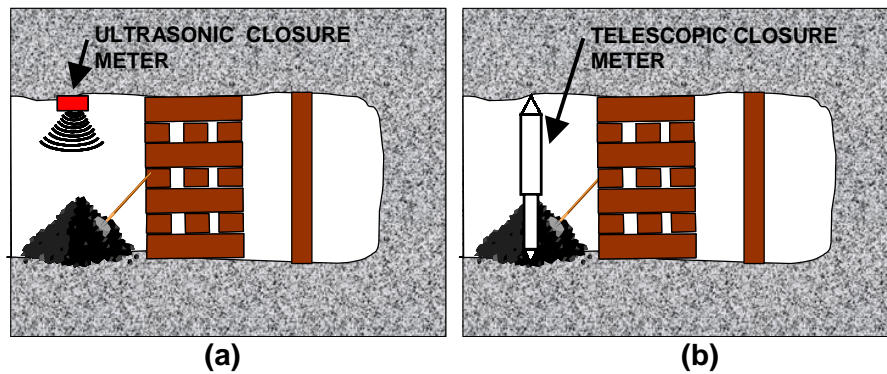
False closure readings caused by the closure meter (using ultrasonic or infrared/laser distance measurement) in (a) when rock or material is moved below the transducer. This will not be the case in (b) where the closure meter makes physical contact with both the hangingwall and footwall.
